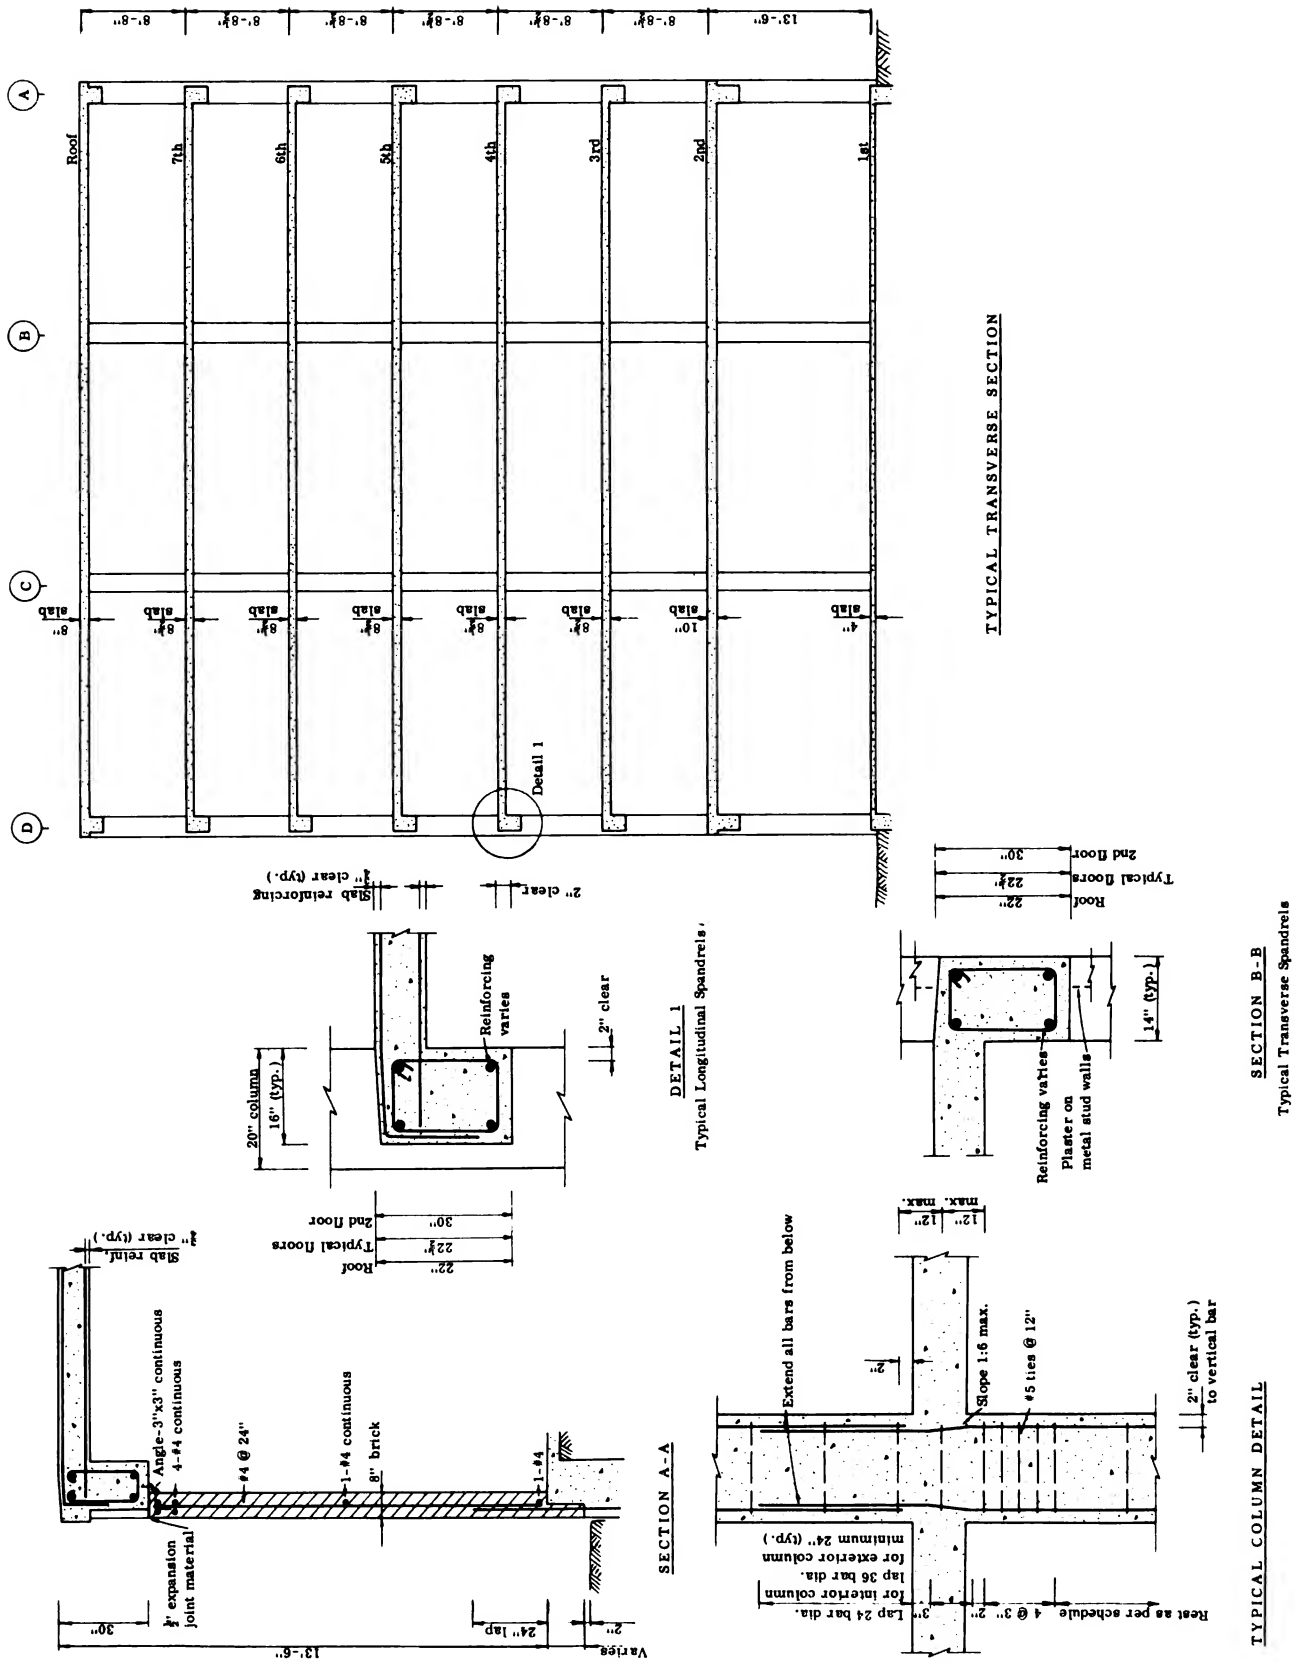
Holiday Inn, Orion Avenue. Sections and details.
